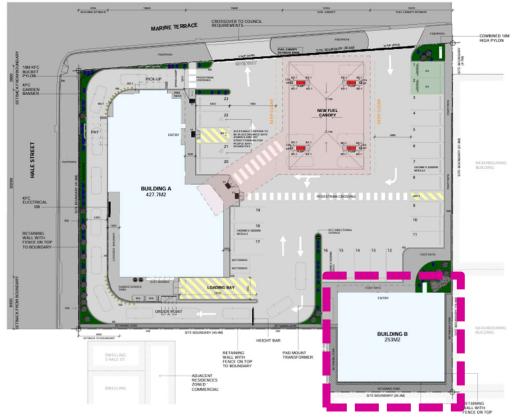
Building subject to the proposed planning application (Source: inaspace Architecture + Design)
